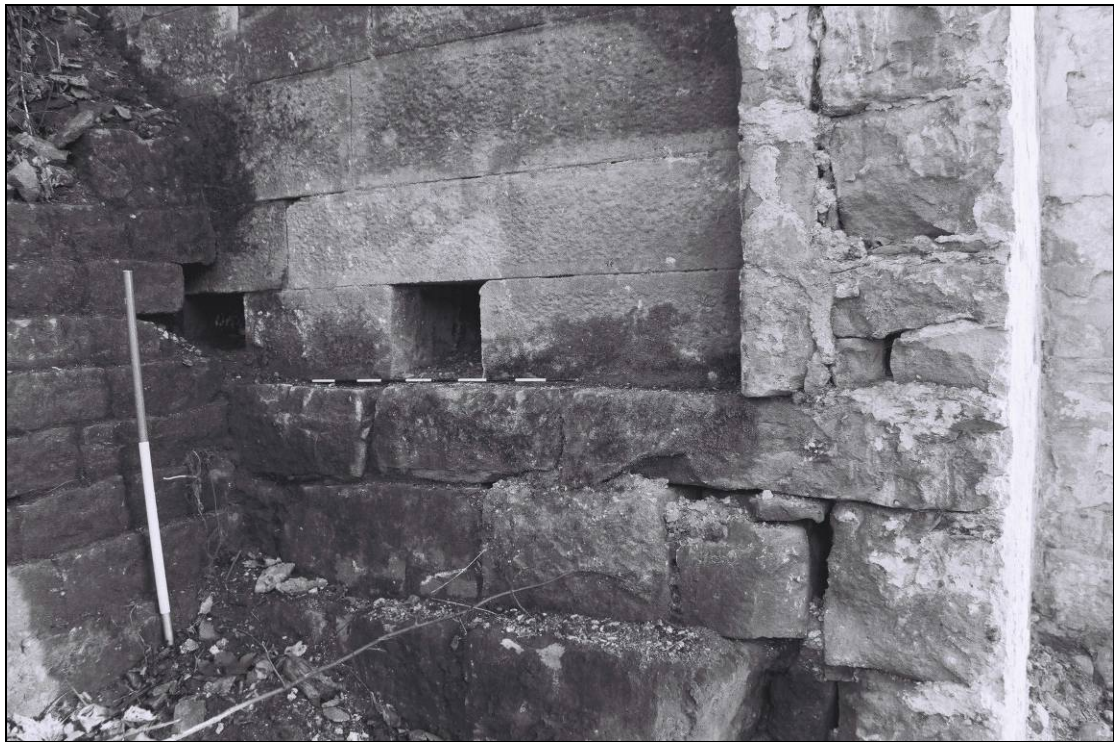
Access holes to hold down bolts in masonry of building 8, and truncated remains of the northern wall of building 6 (film 15:33)
